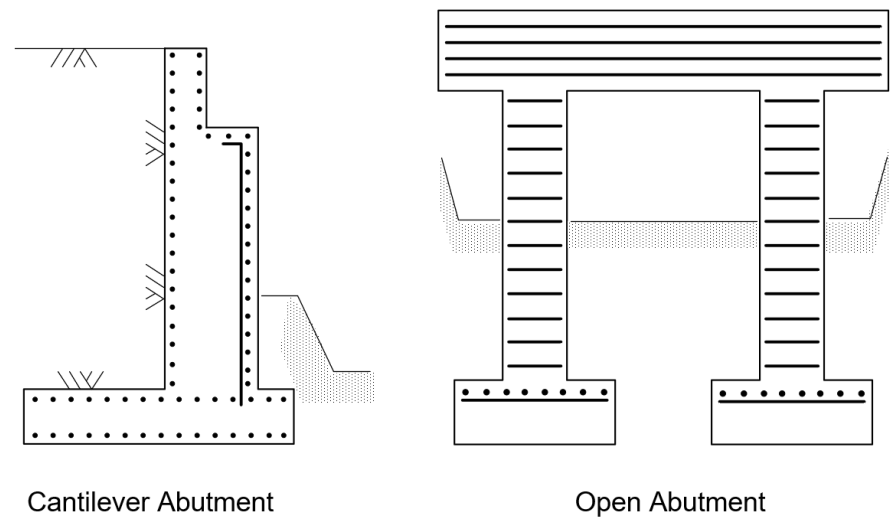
Secondary Reinforcement in Concrete Abutments
